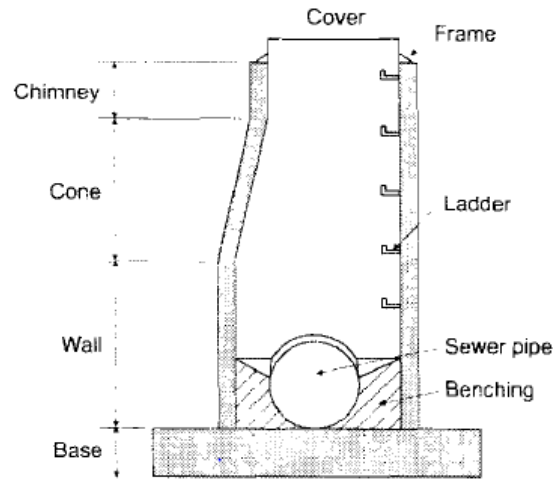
8 Elevation View of Typical Access Holes (Zhao et al. 2001)
